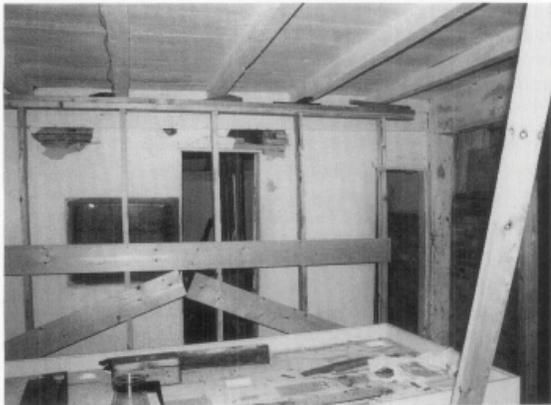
Interior bracing which will last the duration of the mothballing will protect weakened structural members. Jethro Coffin House. Photo: John Milner Architects.
